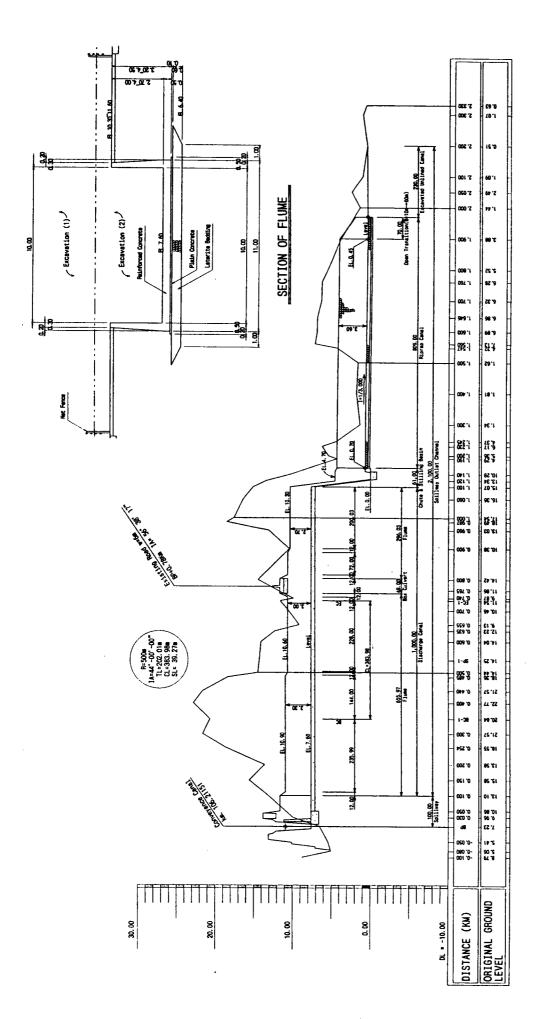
Profile and Sections of Spillway Outlet Channel
